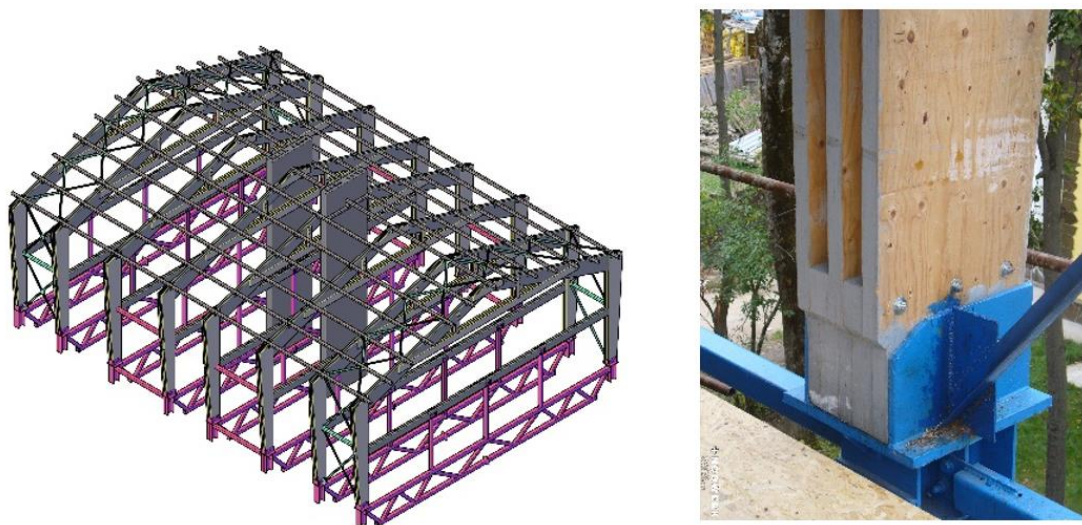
The LVL timber frame structure and hinged connections with steel columns (Nodwerk 2008)
